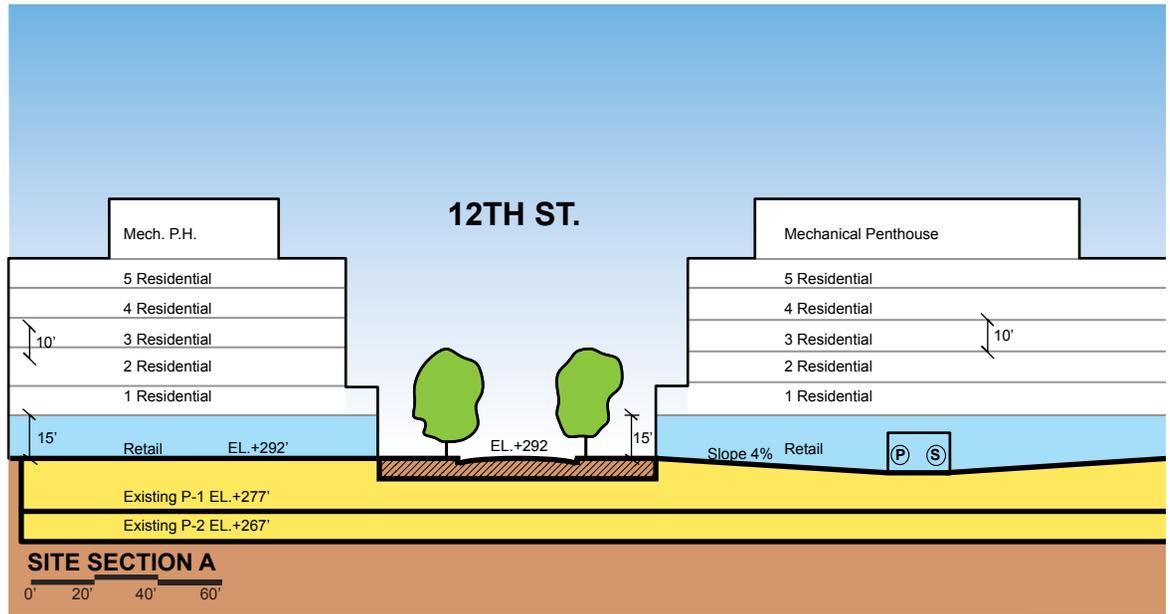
Town Center Site Section. Source: Perkins+Will.
